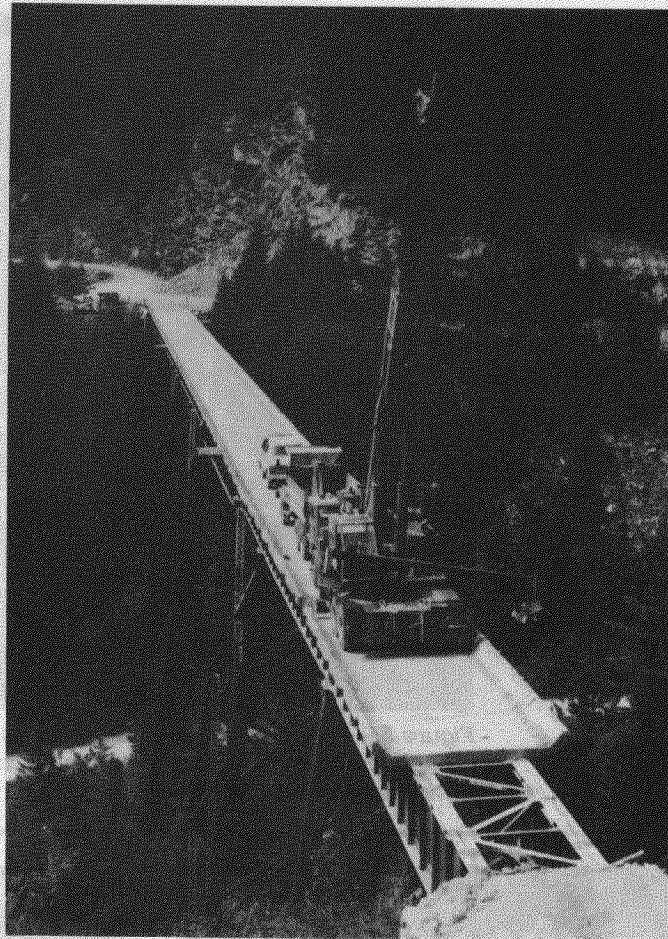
Removal of the existing concrete ballast boxes from the Squaw Creek Bridge. Ballast boxes were used to construct a retaining wall.
